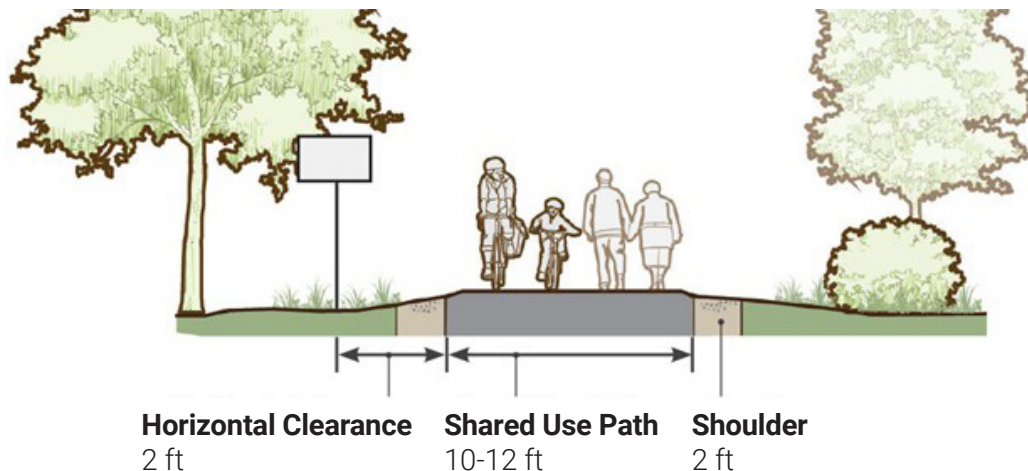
Typical shared use path section (Source: FHWA Small Town and Rural Multimodal Networks Guide)
